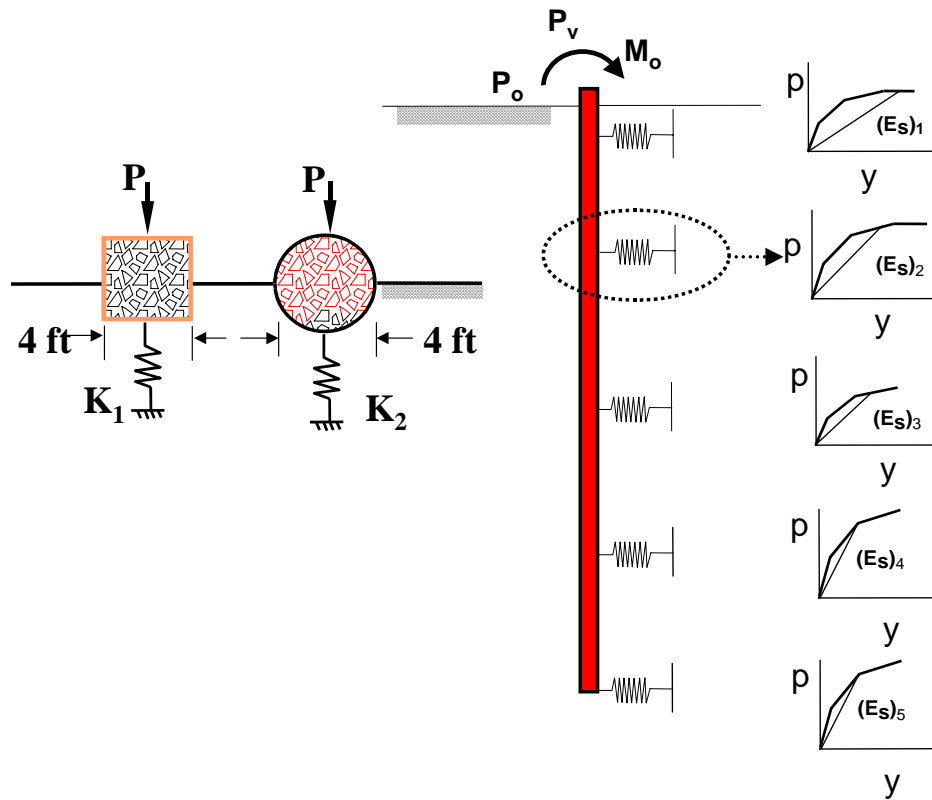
One-Dimensional Beam-on- Elastic Foundation (BEF) or Winkler Springs Characterization
